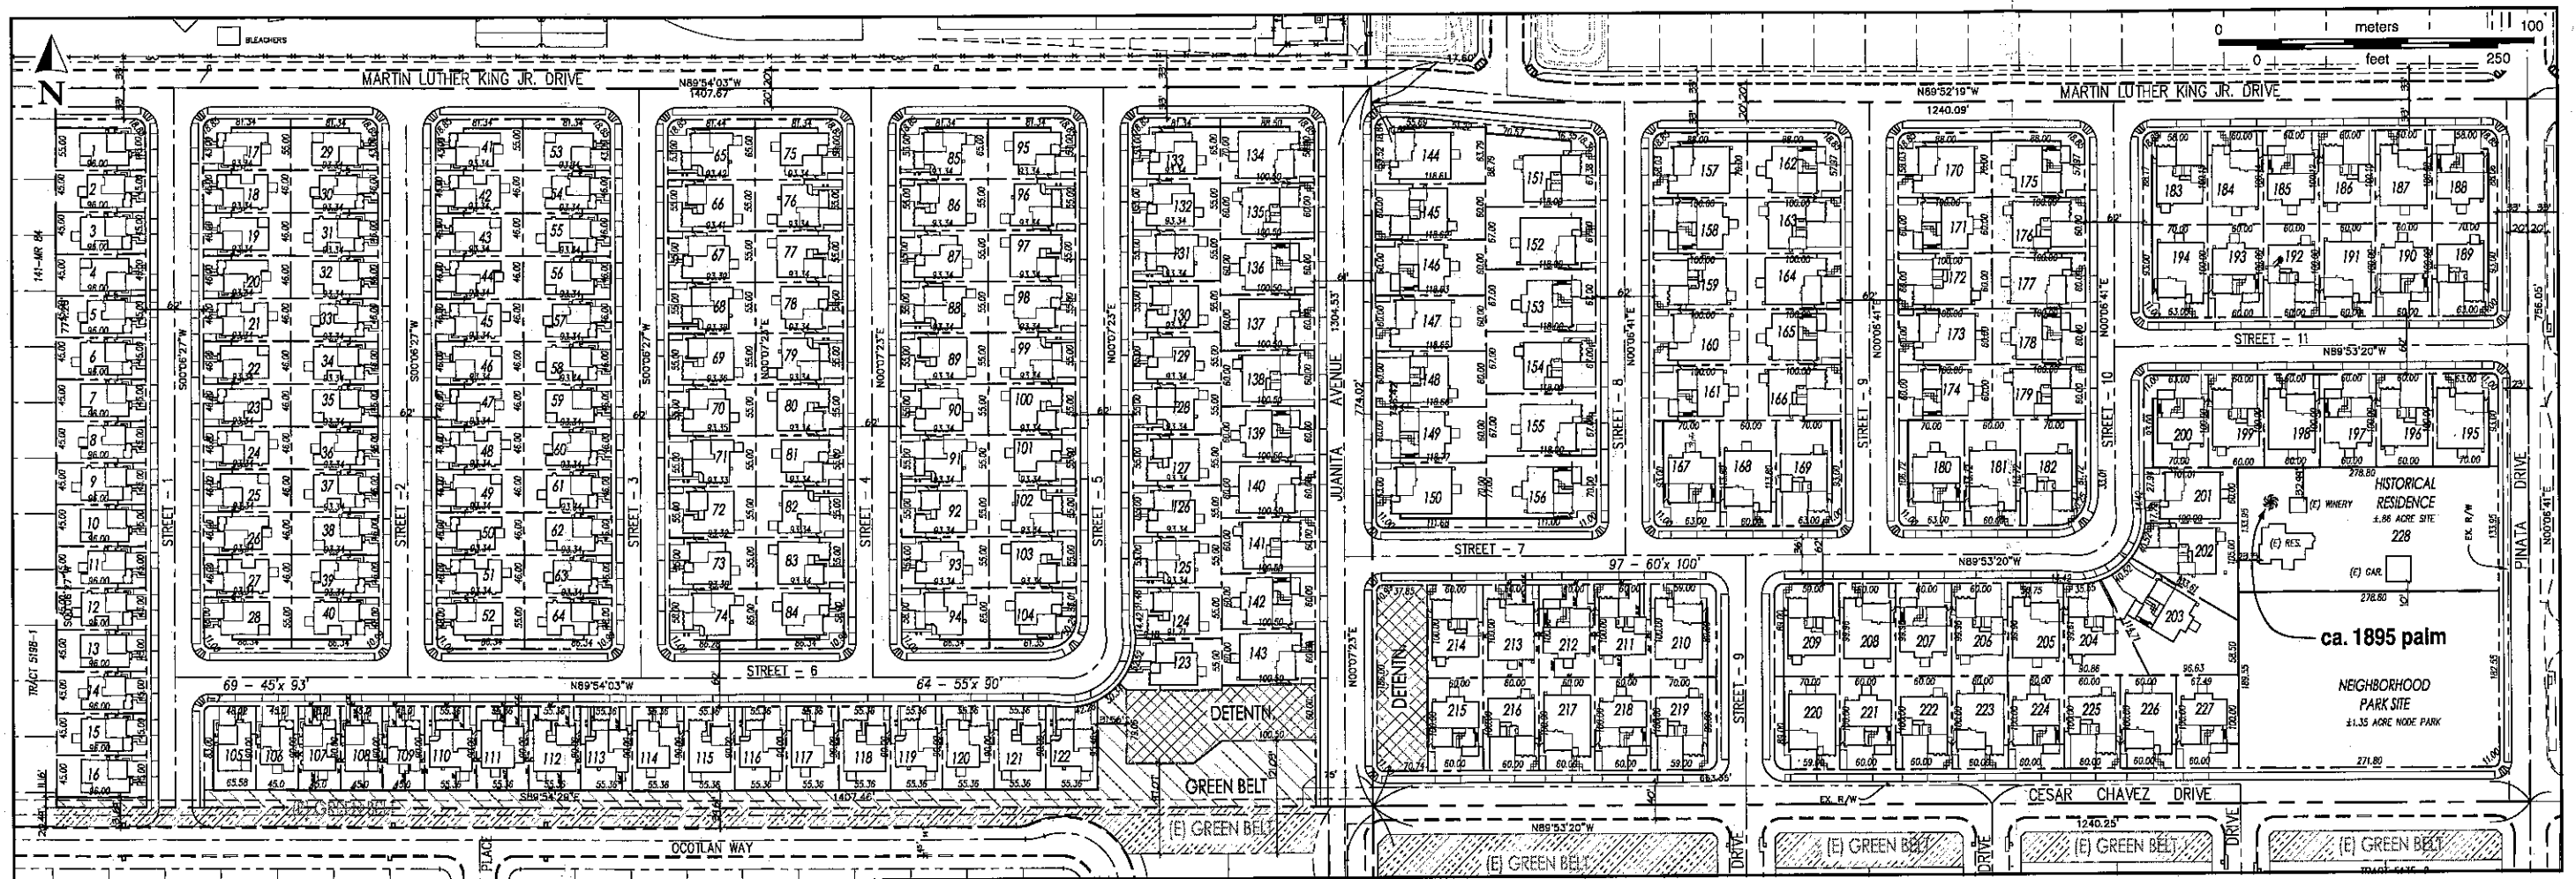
Site plan for 46.82-acre Proposed Project (Tentative Tract No. 5389).
